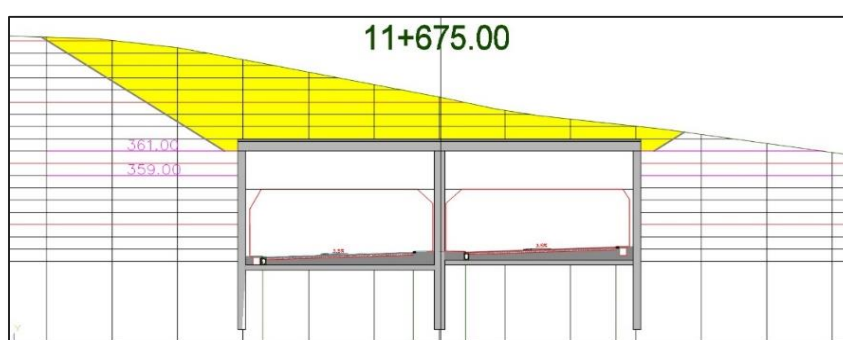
Cross section of a tunnel "Lalinac" on km 11+675.00
